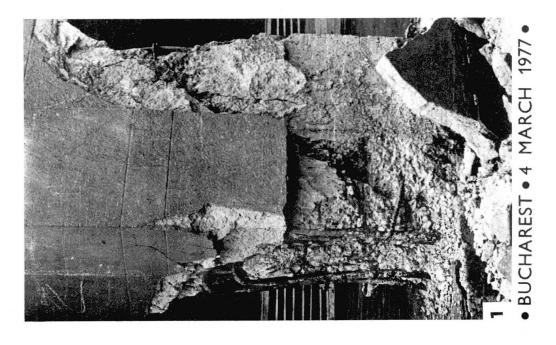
Damage in masonry walls of a structure in concrete frames (build in the '30's)
